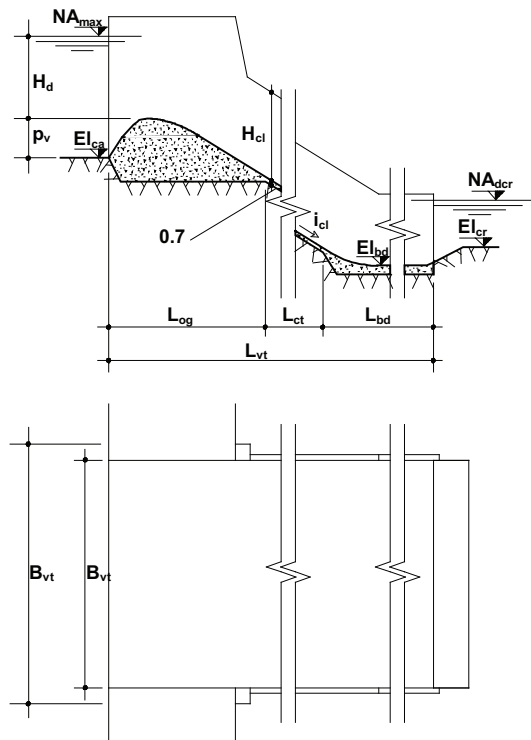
Typical cross-section and plan of an ungated abutment spillway with a stilling basin.
